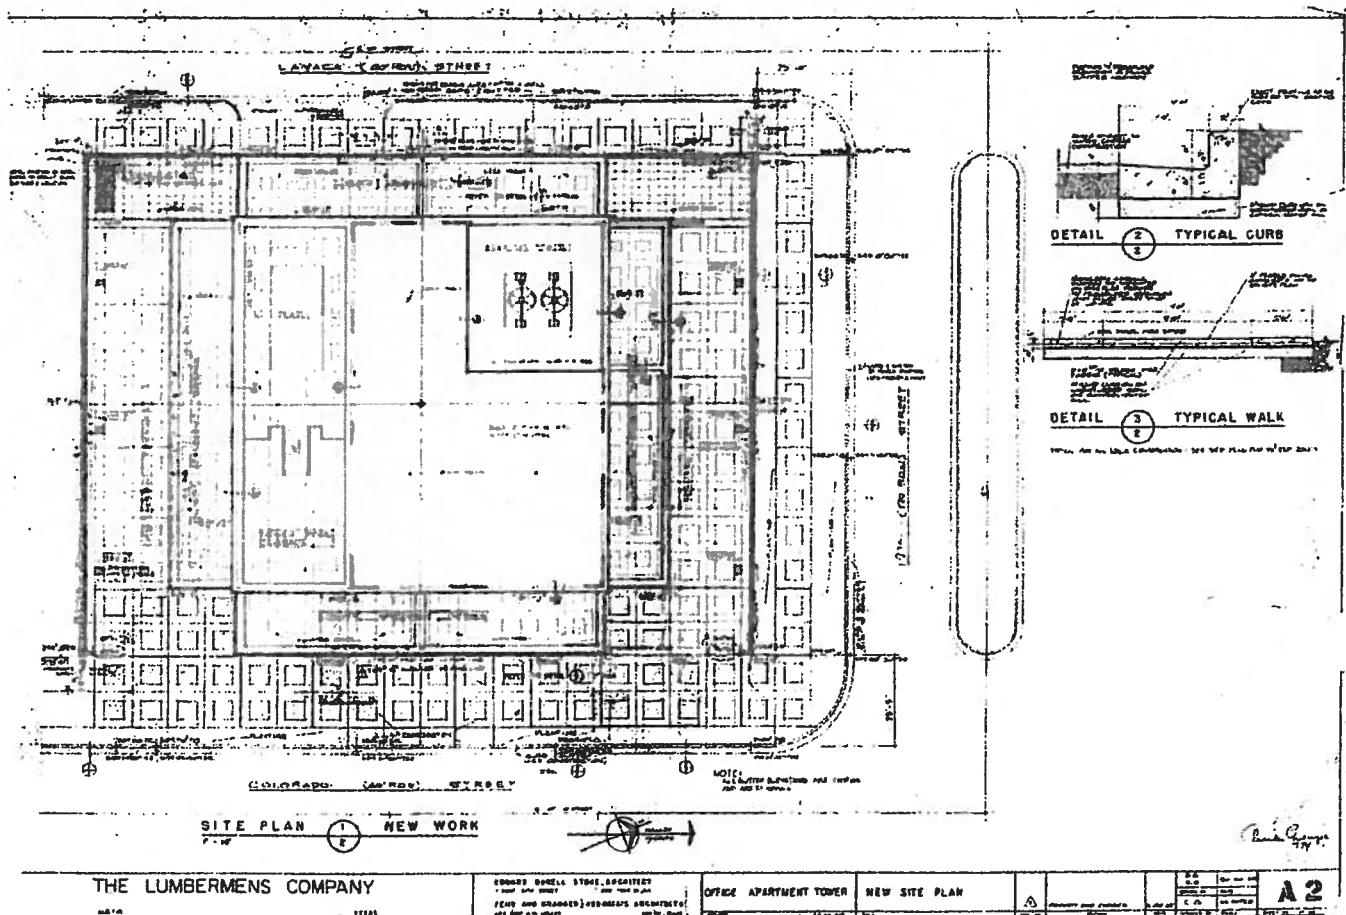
Site plan for the Westgate Tower, showing the patterned concrete at grade and at the Level 10 terraces.
